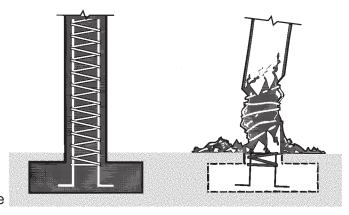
Lack of Reinforcing steel. If the confining reinforcing steel in a column is too widely spaced (a), it will not be able to keep the vertical reinforcing bars and the concrete in place when it is shaken by an earthquake (b).
